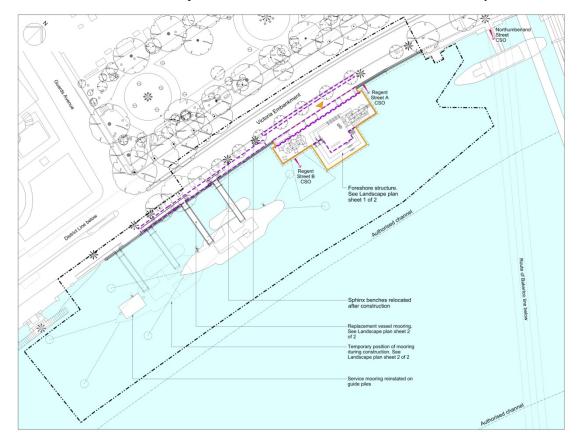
Landscape plan in the application (extract from proposed site features plan: DCO-PP-16X-VCTEF-180011)
